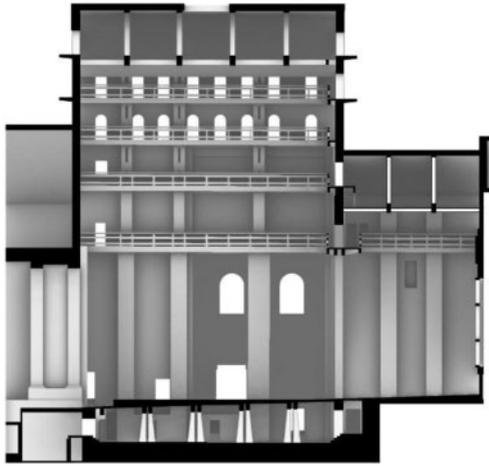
Longitudinal section of the Municipal Theater's stage tower. (© 2020, Beatrice Salmi).
